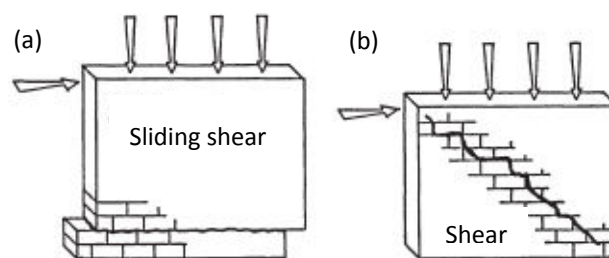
(a) Sliding shear failure and (b) diagonal shear failure in masonry walls. Source: Tomažević [182].
